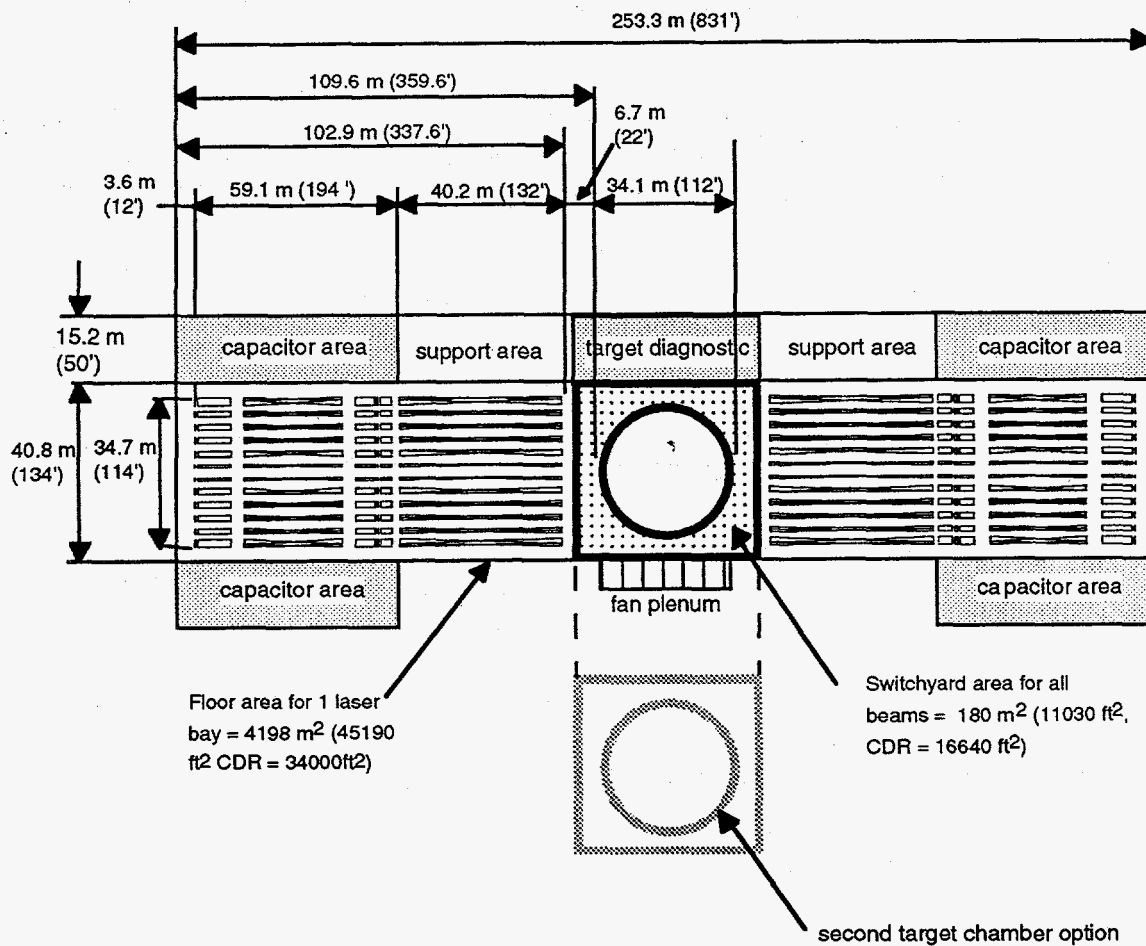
Plan layout of an in-line 4x2 bundle concept.
